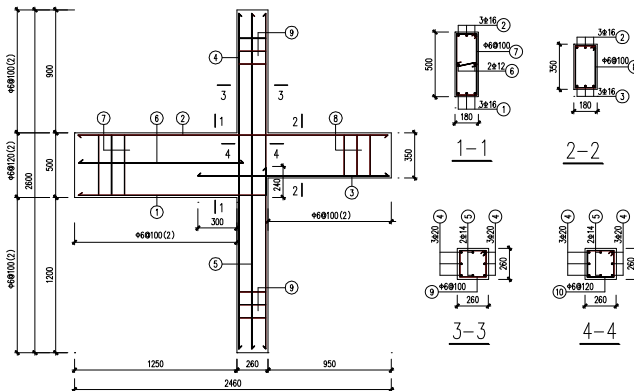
Arrangement of reinforcement of specimen WJ-3
